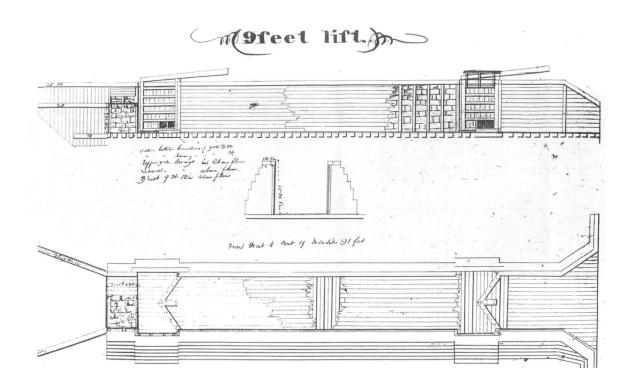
1845 Plan, Section and Elevation of Typical Lock Construction (The Canal Society of New Jersey)
